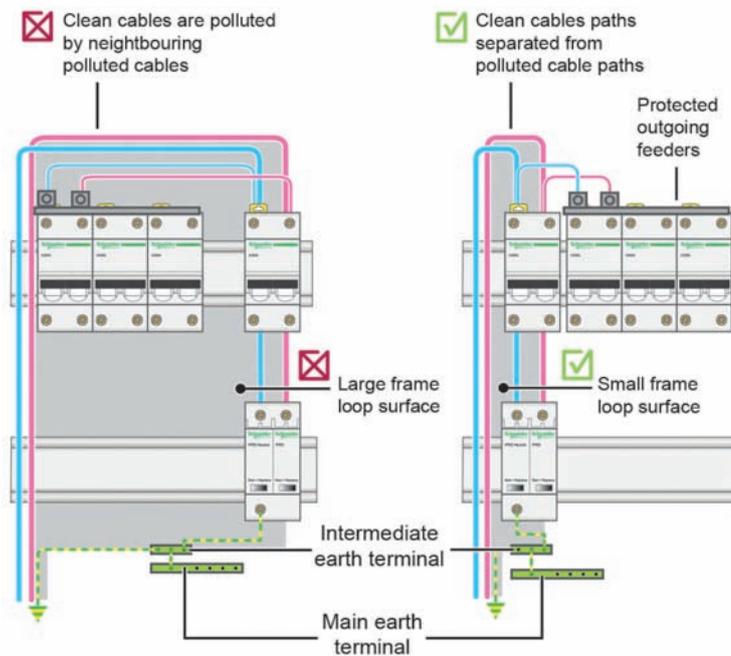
Recommendation for electric switchboard wiring (Source: Schneider Electric)
